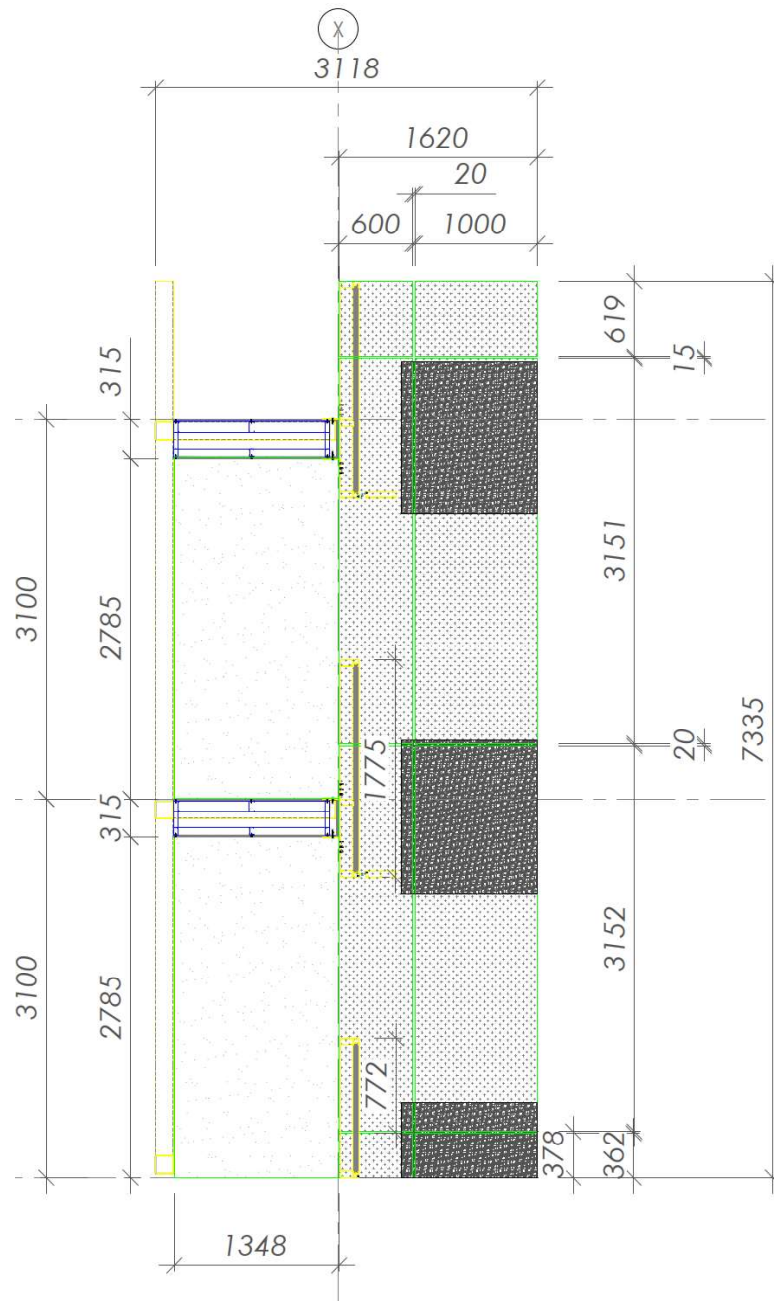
Elevation view of wing wall – ACP curtain wall overall measurements
